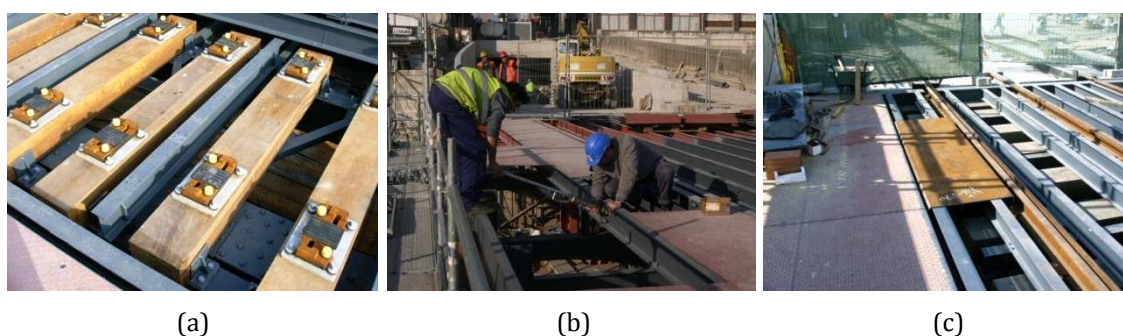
Floor system of the upper deck after the bridge rehabilitation: (a) sleepers and secondary crossbeams resting on the main stringers, which carry metro and pedestrian loads, respectively; (b) execution of a bolted connection at the joint of a secondary stringer; (c) placement and attachment of the steel cladding plates over the secondary stringers.
